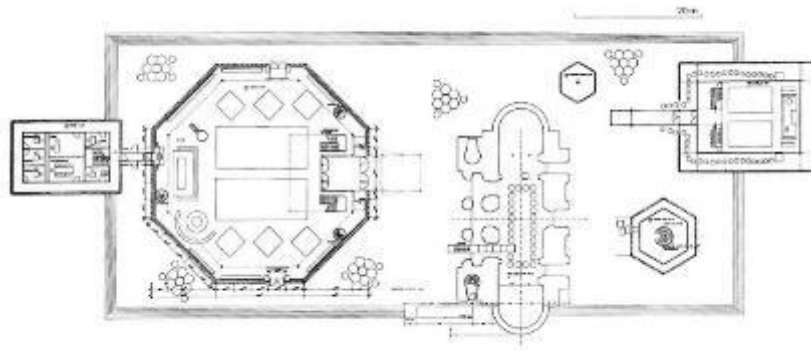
Proposed Plan of the New Nave and Bell Tower (1963) © Archiweb
